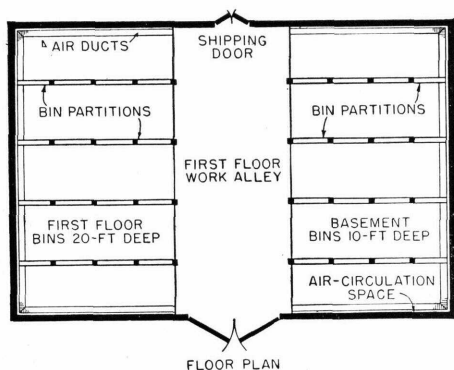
Maine trackside storage. Many of these newer houses are so arranged that trucks can be driven into the work alley for unloading. To fill upper bins, barrels are hoisted to elevated platforms.
